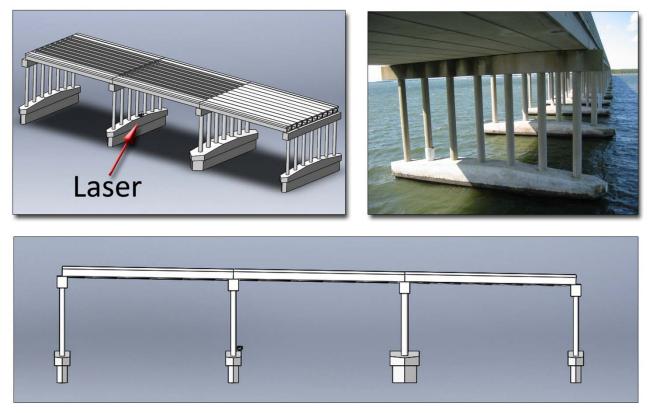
Three dimensional CAD model for a concrete slab bridge.
